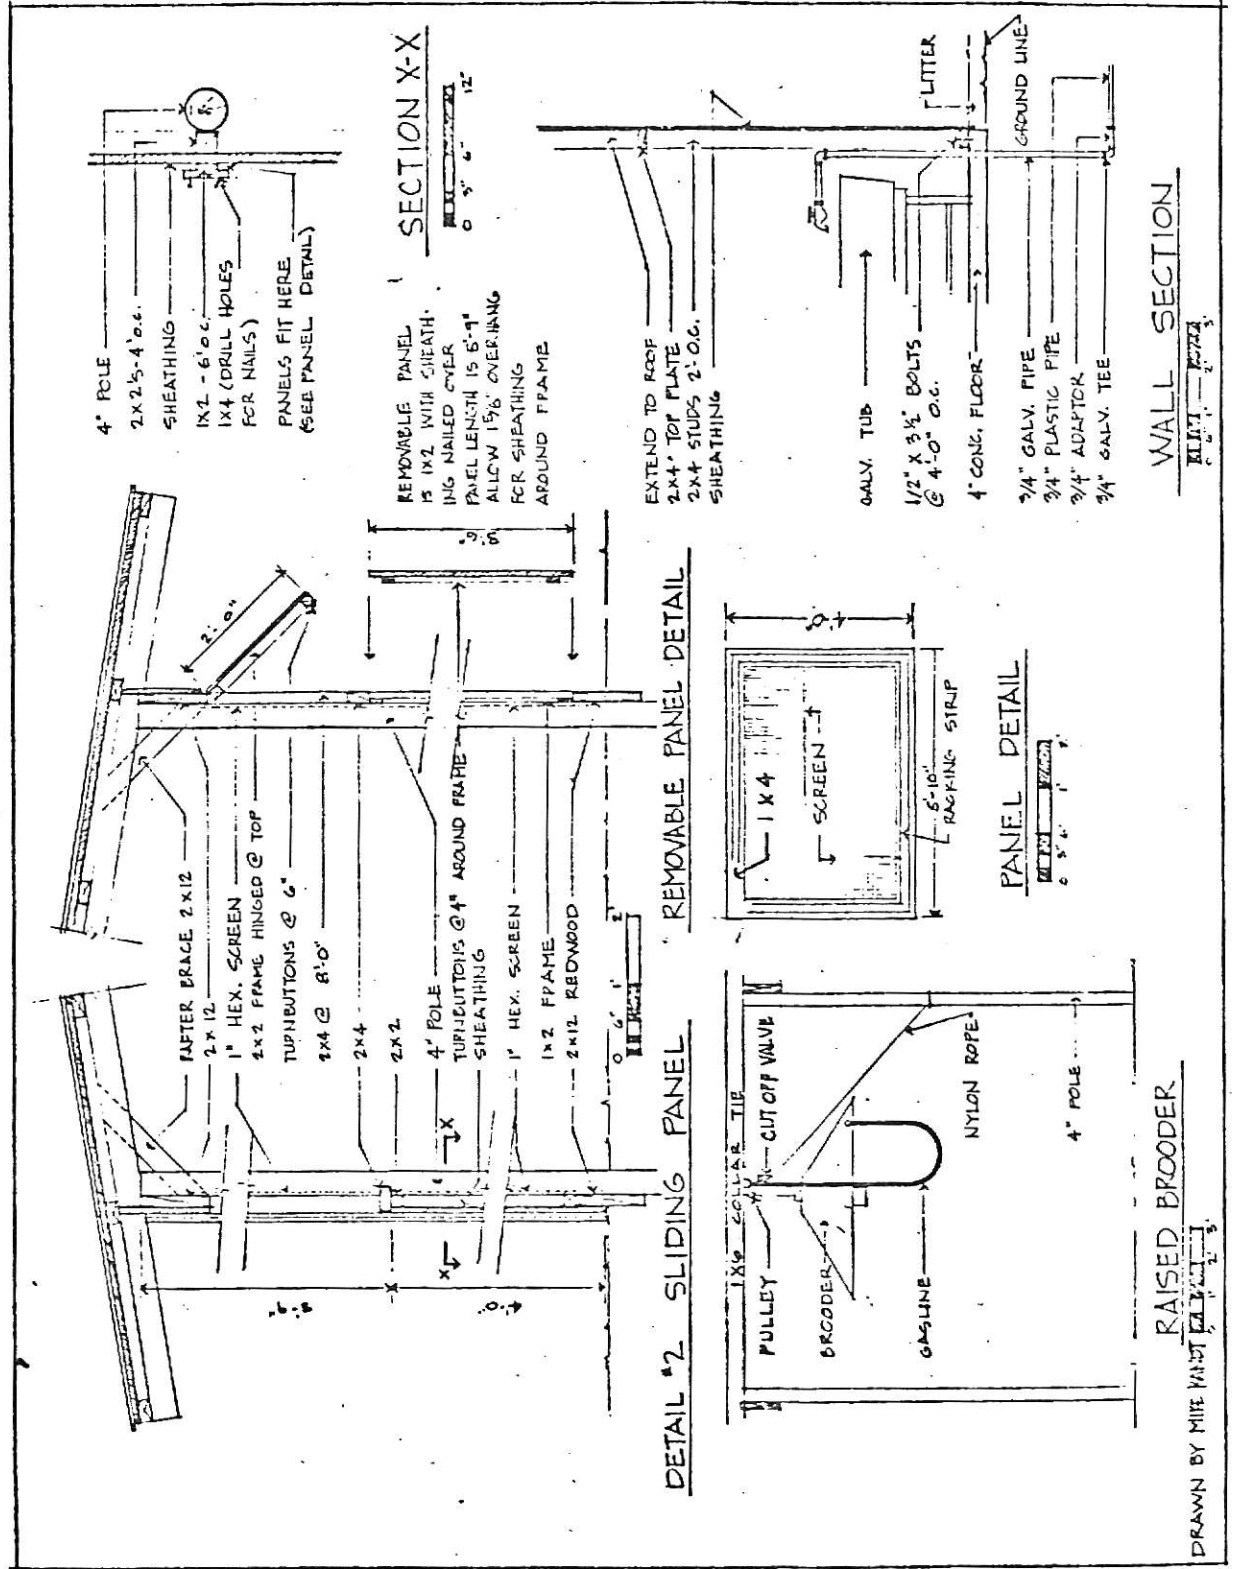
Plans for the 36' x 72' Kansas pole-type poultry house and equipment.
